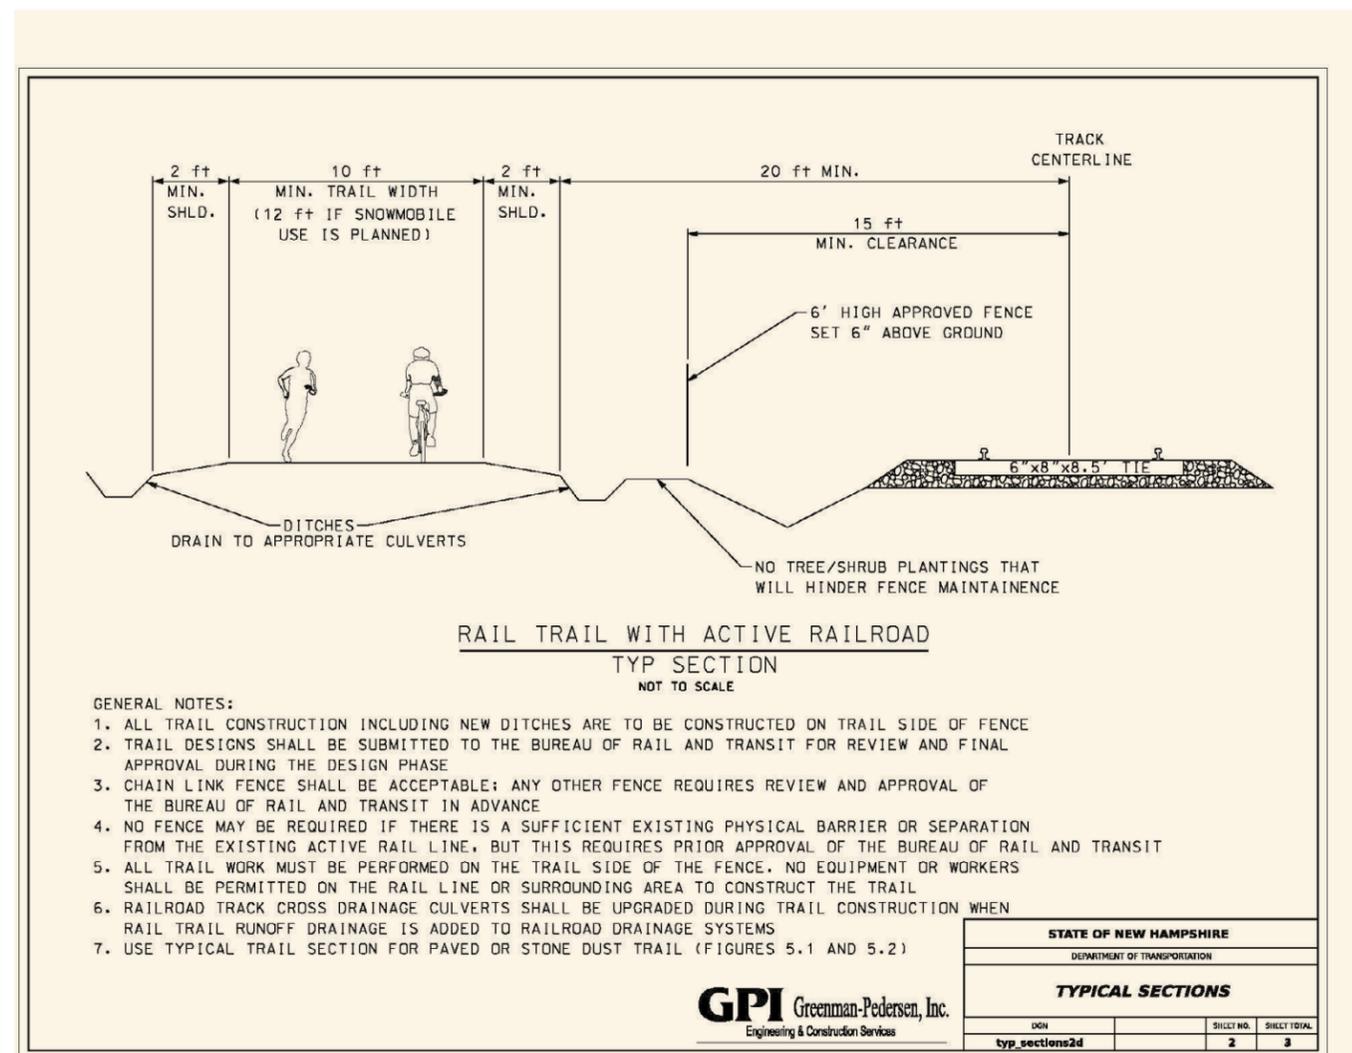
Typical Section – Rail Trail with Active Railroad
